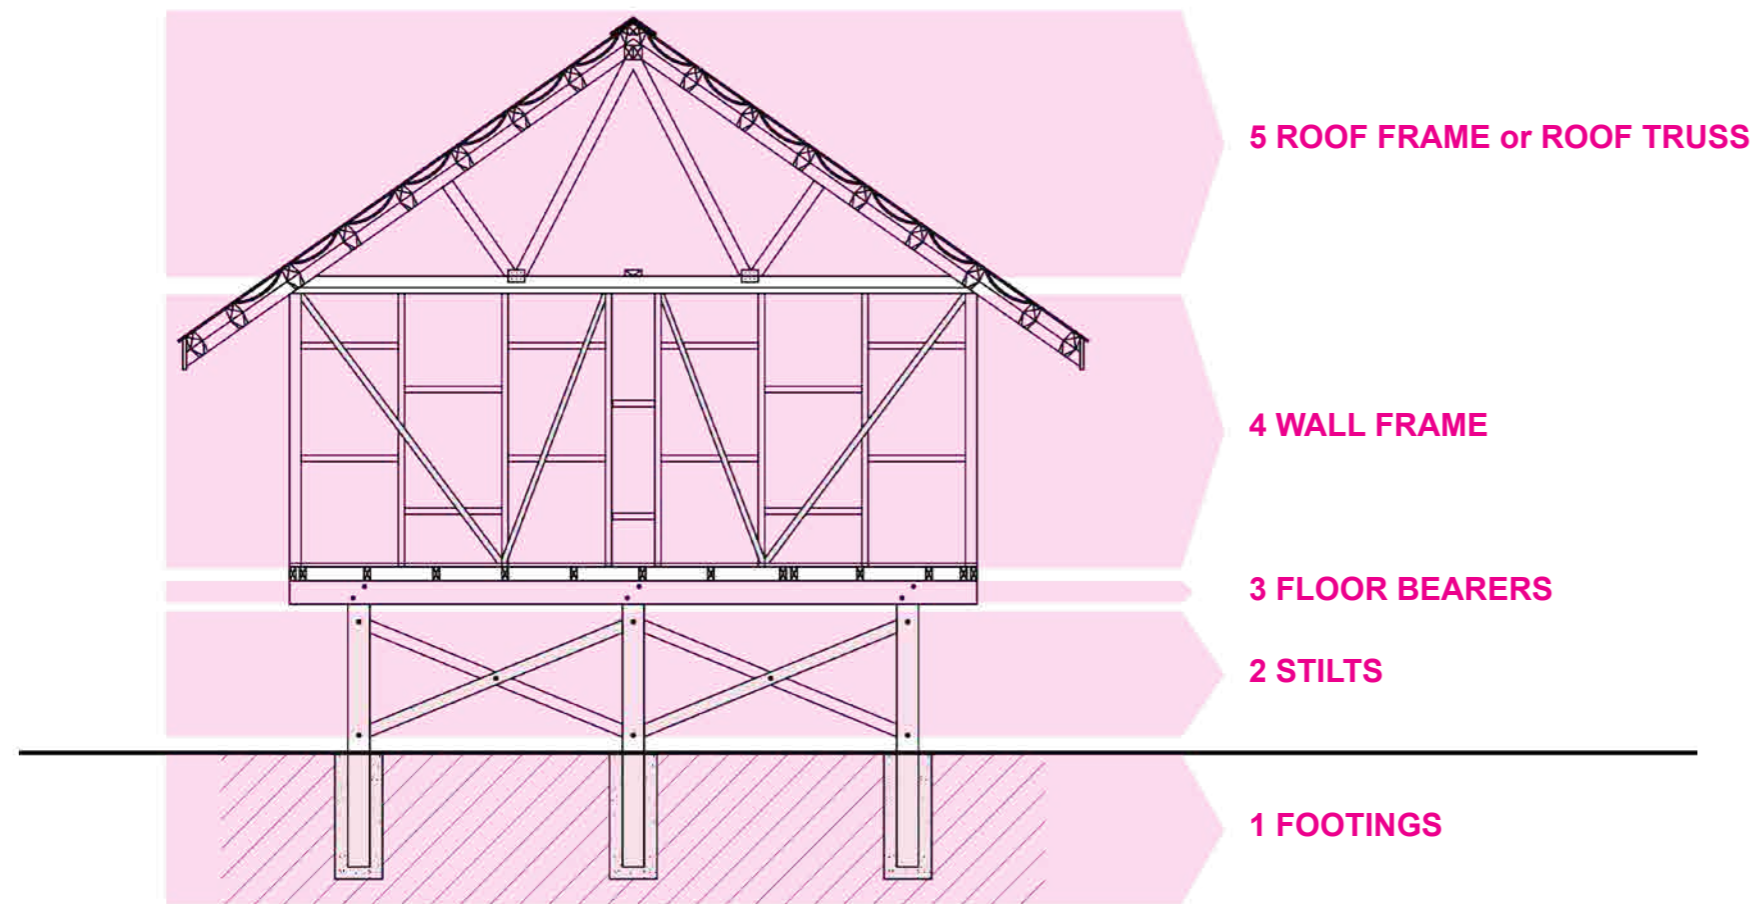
Key structural parts of a typical house with floor raised from the ground.
